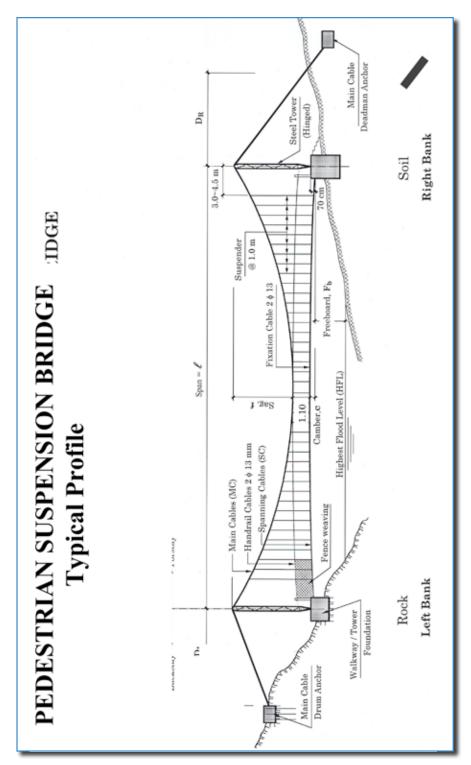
A Typical Profile of Suspension Type Bridge
